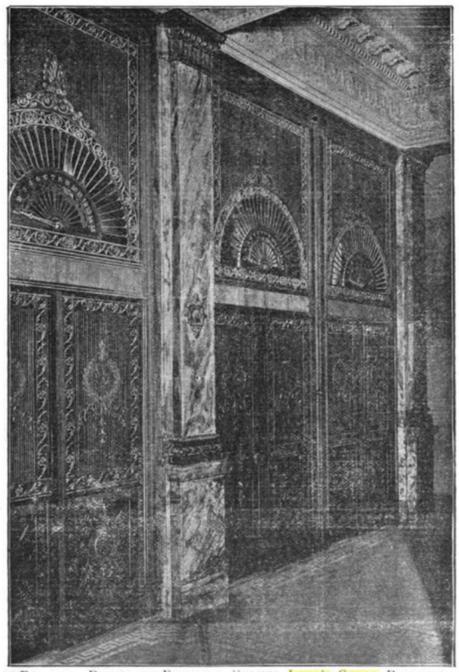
DETAIL OF ELEVATOR FRONTS, LORD'S COURT BUILDING.
